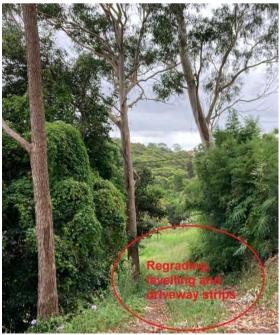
Significant vegetation within the area requiring regrading to provide access to proposed garage in the Westminster Road reserve. Source: CPS site inspection dated 21 March 2023.
